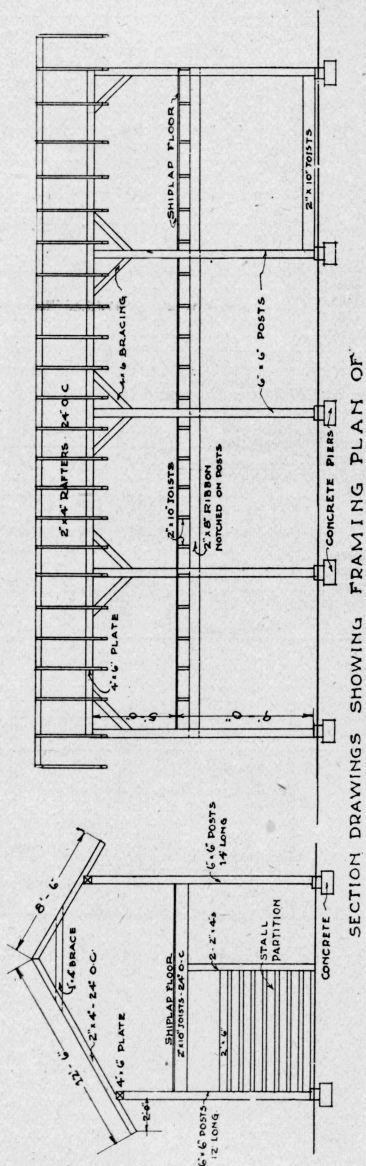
Framing plans of shed-type of barn with four stalls, with loft.
